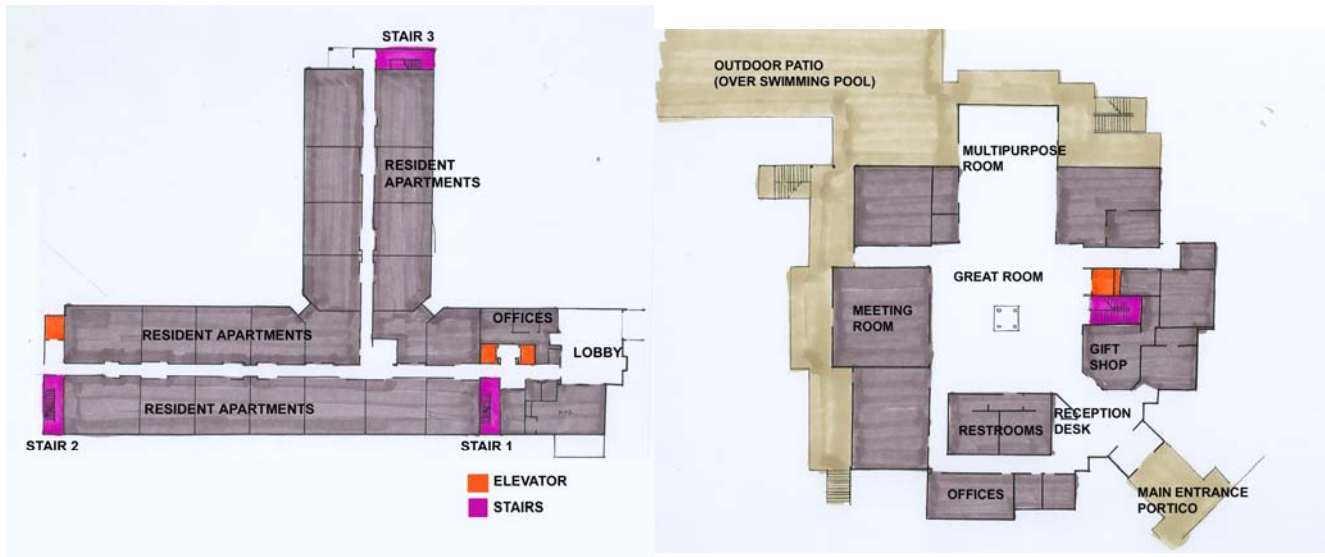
Buildings plans of the first floor of the RSC building (left) and main floor of the Village Center (right)
